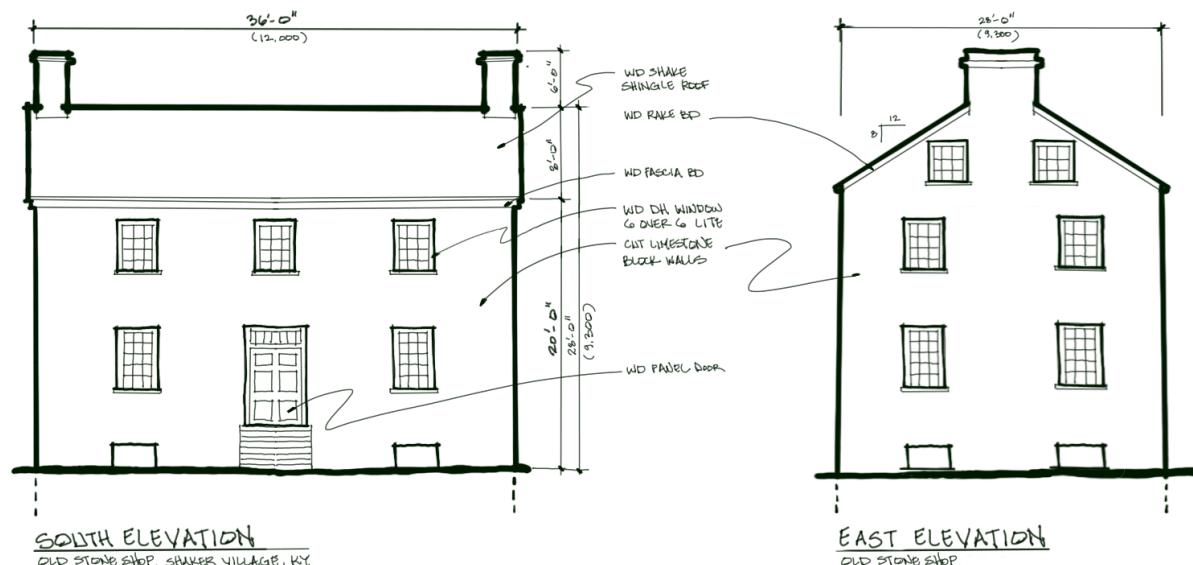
Field Sketches of Two Exterior Elevations of Large Buildings
